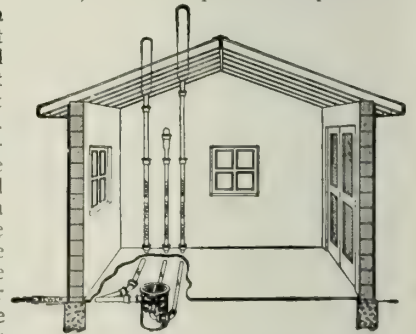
(PATENTED) SHOWING INSTALLATION OF DEHN'S "PEERLES" GARAGE DRAINAGE SYSTEM
